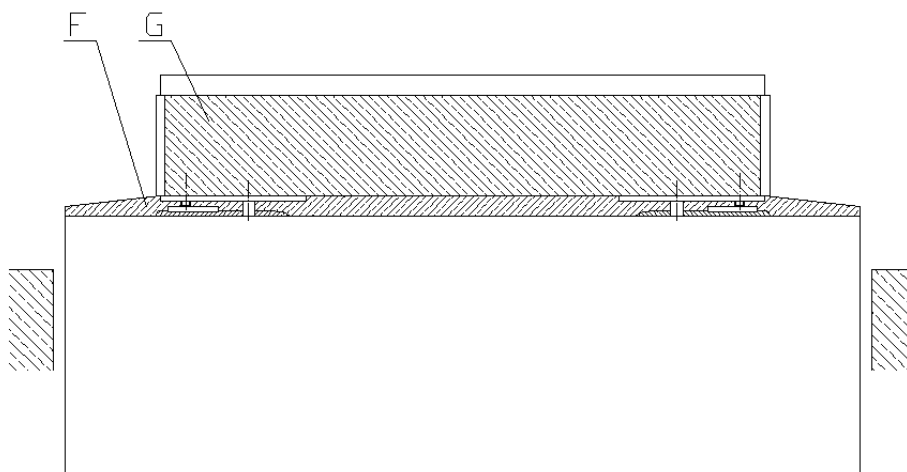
Position of the pump base plate or the motor base plate
